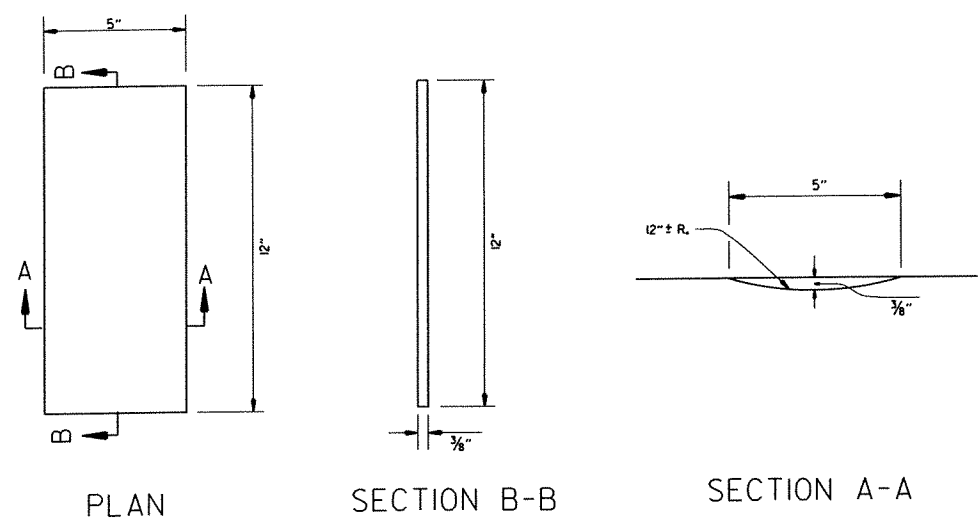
DETAIL FOR RETAINING WALL STA. 524+00 - STA. 525+50
